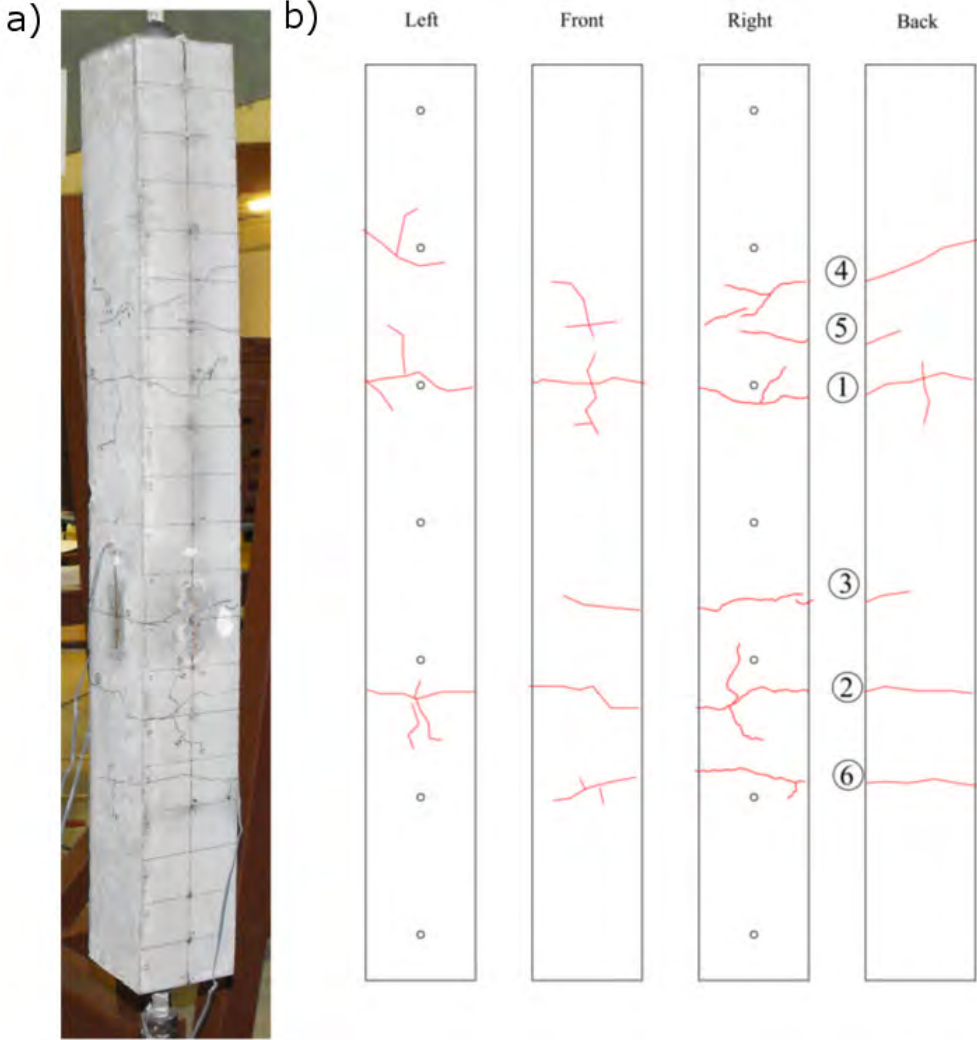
C1F16: a) specimen during testing b) crack pattern.
